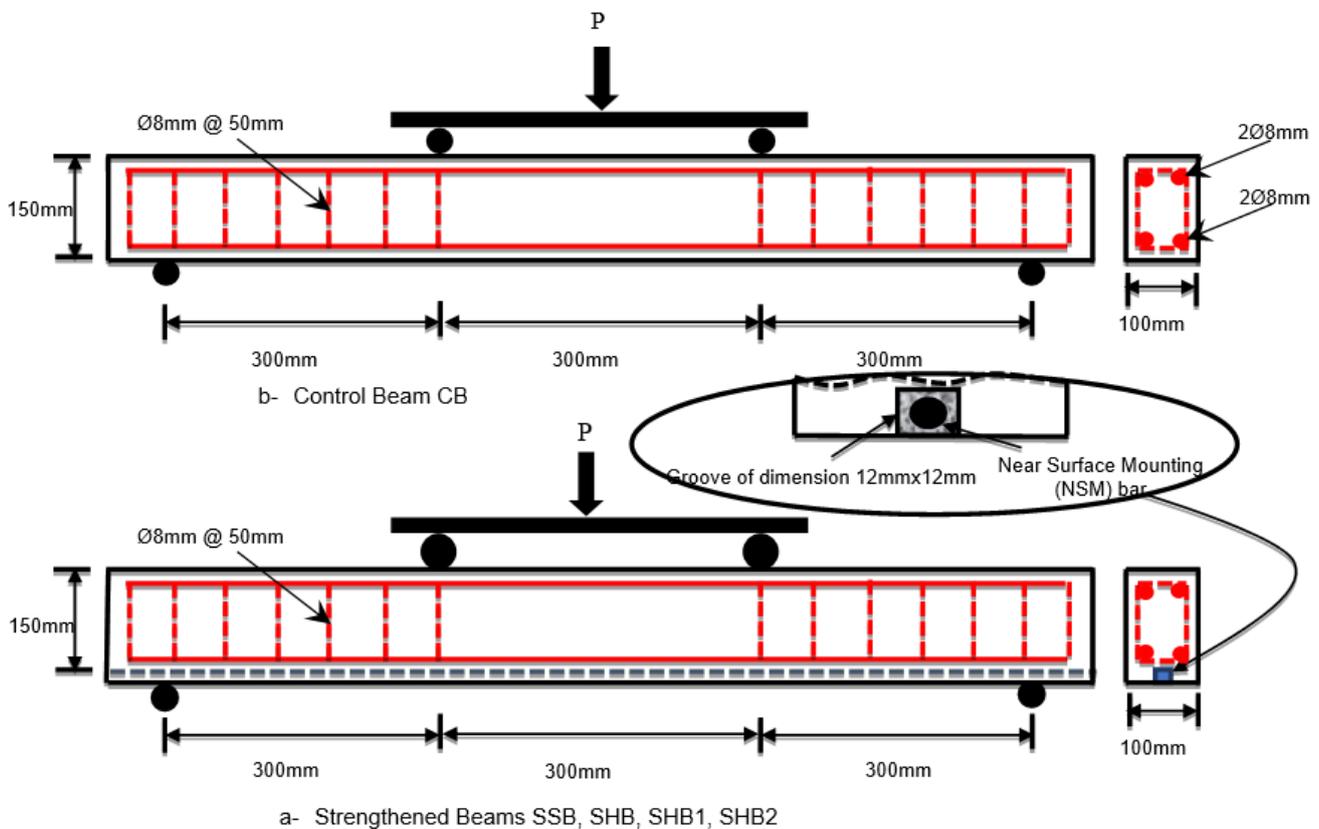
Reinforced Concrete Beam Specimens, a-Control Beam CB, b-Strengthened Beams SSB, SHB, SHB1, SHB2
